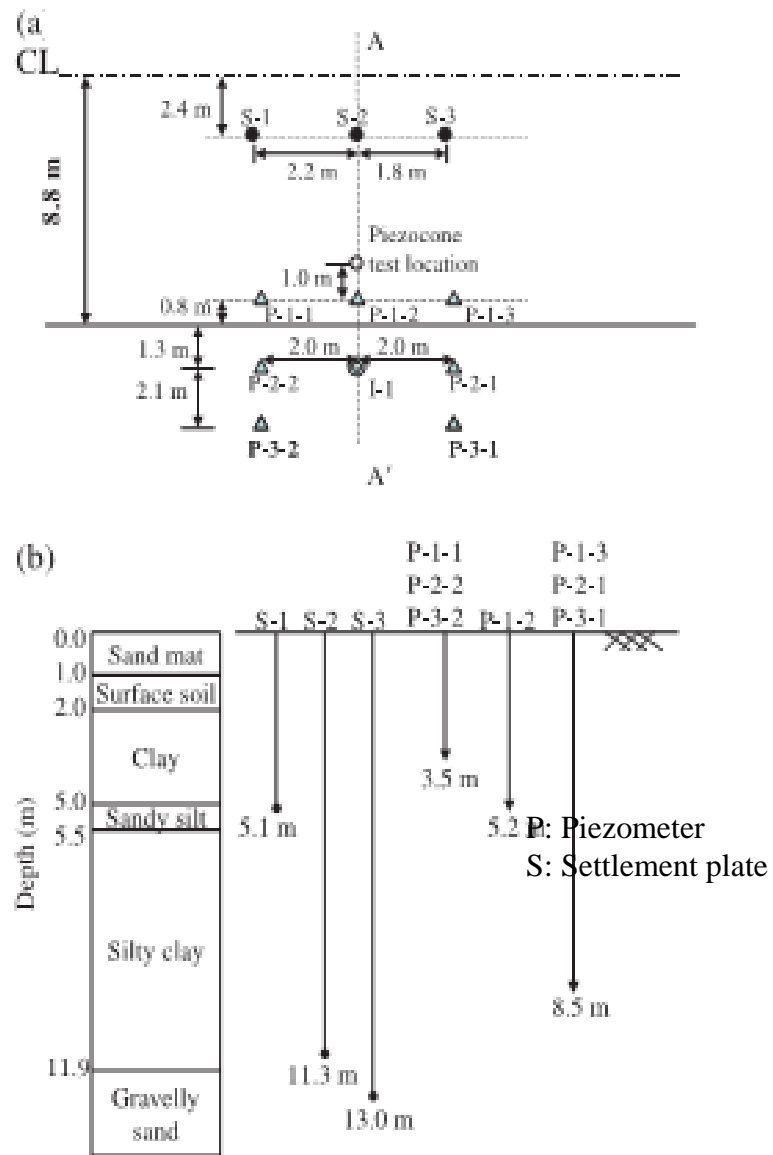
Plan and section of instrumentation at Section 4 (after Chai et al. 2006)
